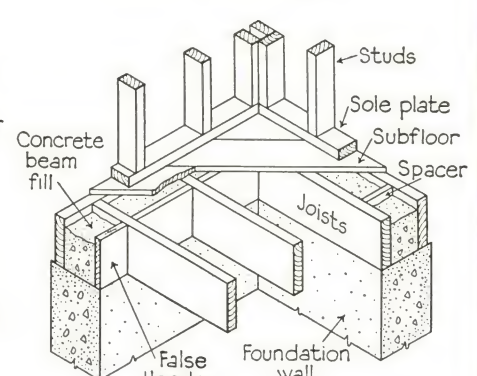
BOX SILL ASSEMBLY WITHOUT SILL PLATE
